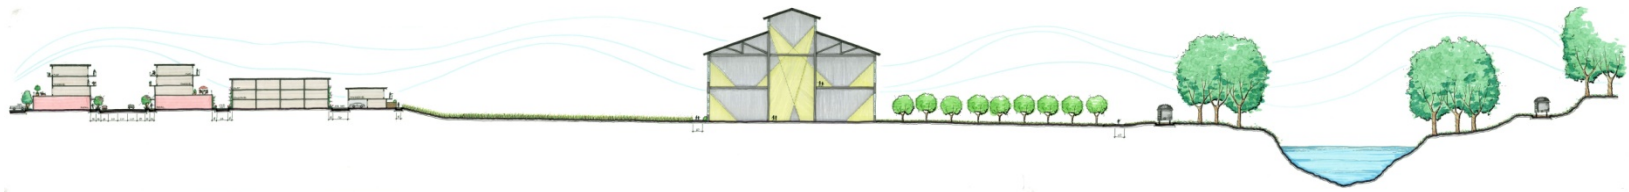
Open Space Section A-A depicting Tree Plantation, Warehouse in relationship to new development and the Mahoning River (N.T.S)
